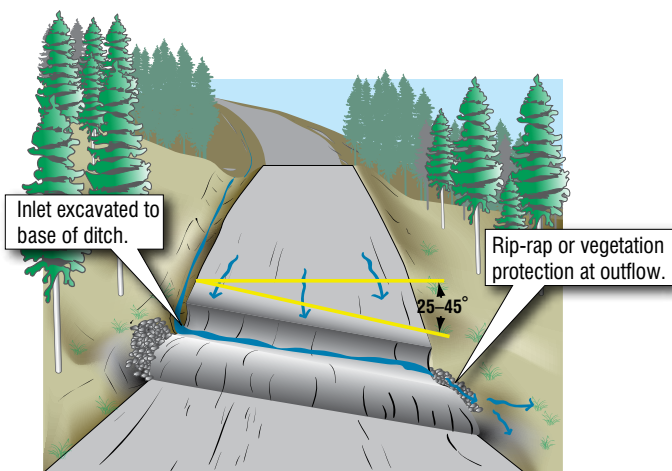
Schematic of a typical cross ditch showing ditch block at inlet and armouring at outlet. Signage may be required to indicate where cross ditches are used, as vehicles need to slow when passing over them.
